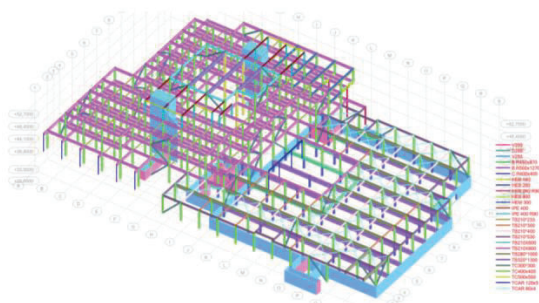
Structure, Isometry – Building. Outline Proposal, Arkitema/COWI
